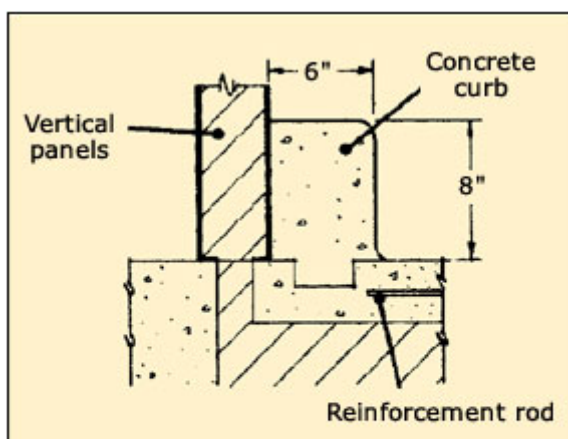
A concrete curb protects wall panels from damage and provides space for air circulation around stored products
